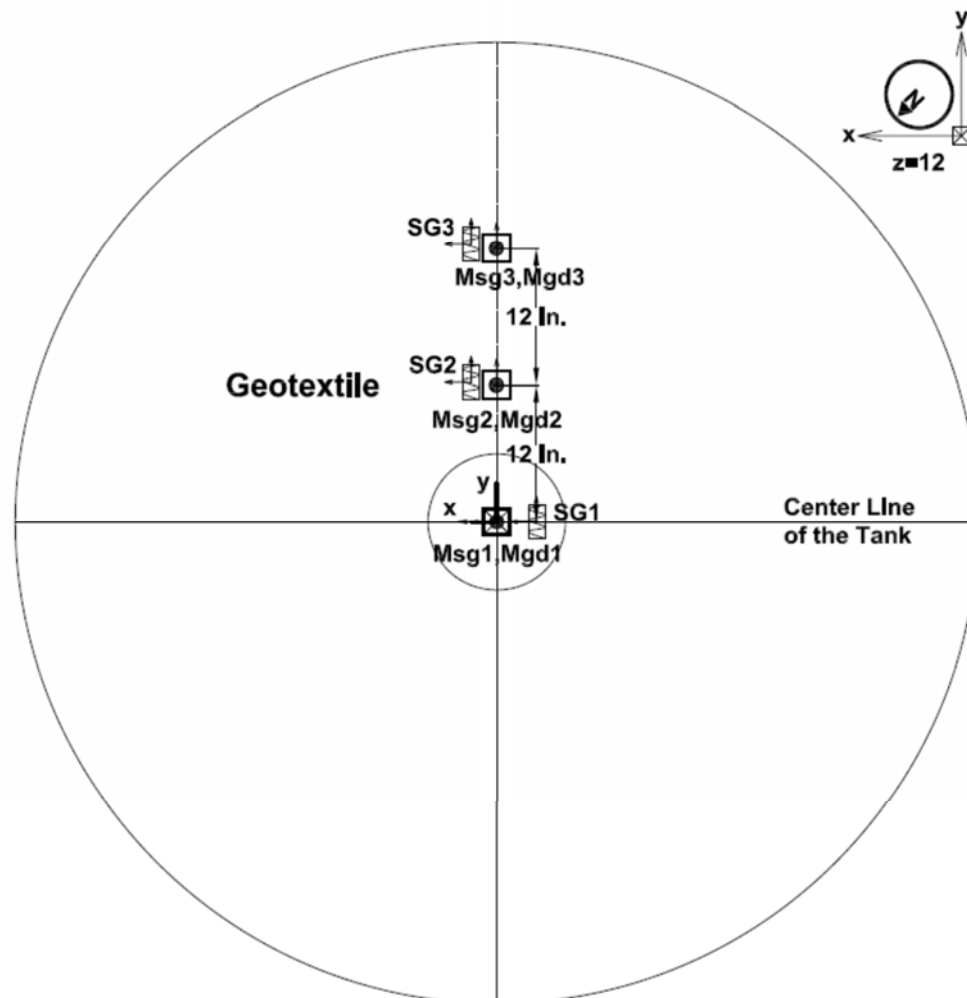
Instrumentation plan for experiment No. 5—Plan view, $Z = 12$ inches
